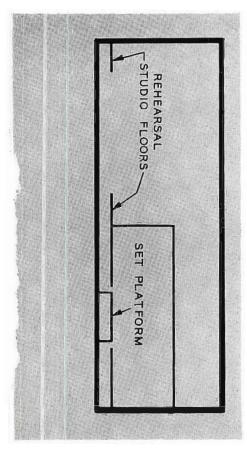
Floor plan layout of a "streamlined" TV studio constructed on 20' x 40' platforms. Platforms are supported by wheels which move on rails. Platform floors and shop floors are at same elevation.
